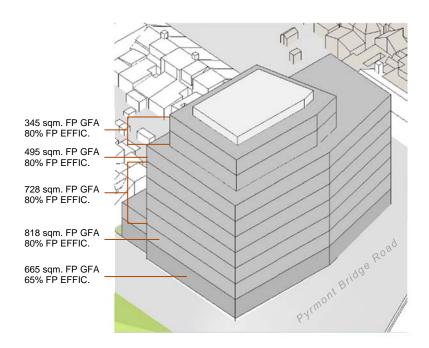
isometric of proposed building envelope for 46-48 Pyrmont Bridge Road
